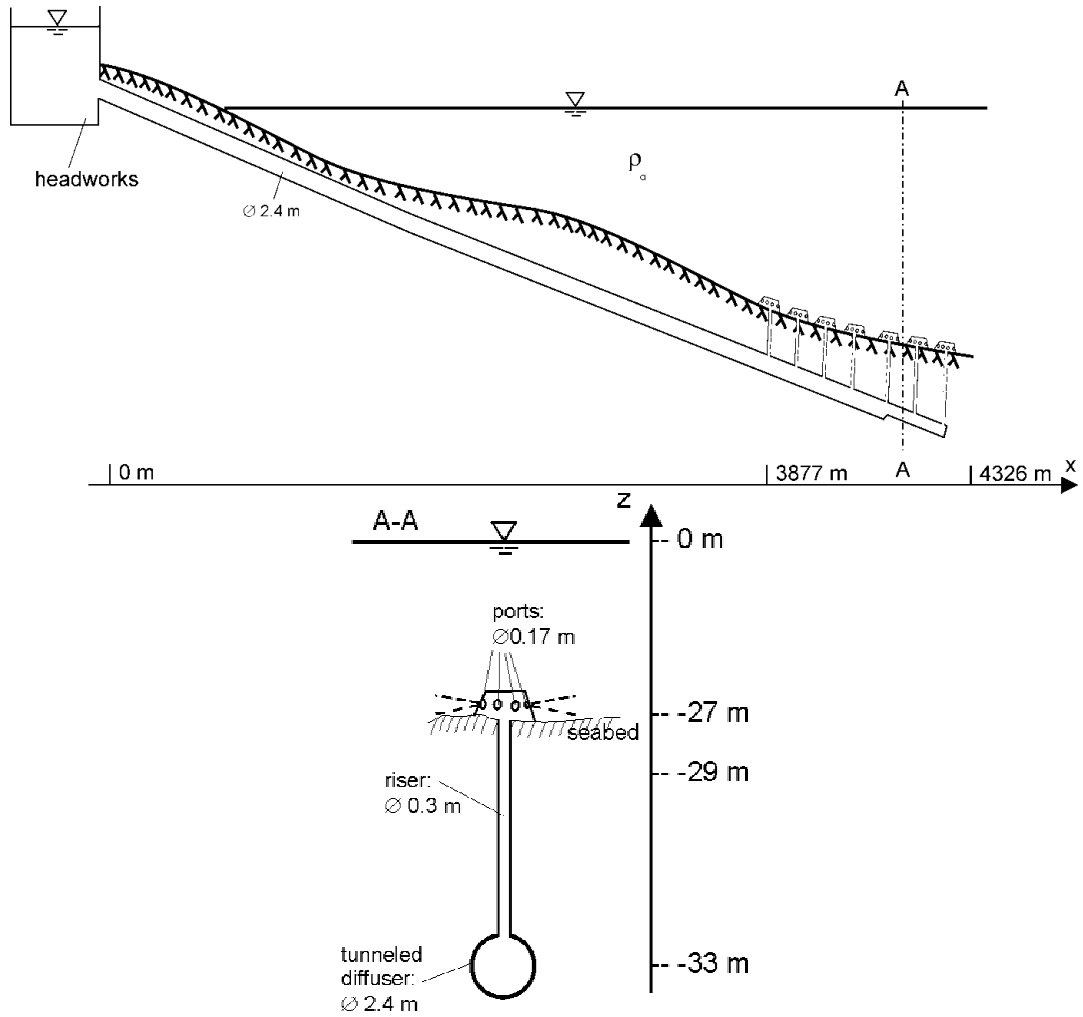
Side view and cross section of a constructional design alternative for the Ipanema outfall with a tunneled diffuser pipe, long risers, and rosette like port arrangements.
